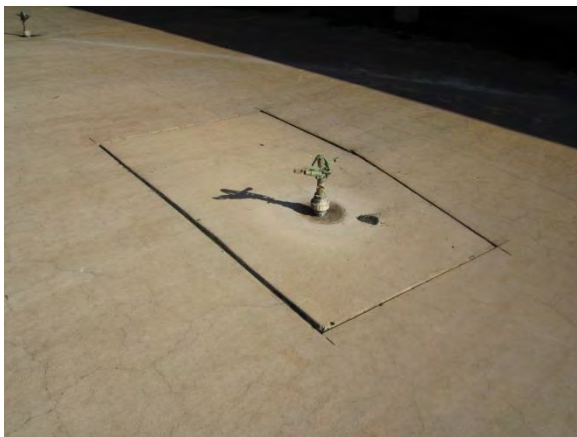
Joints surrounding sprinkler near north end of FEB.
